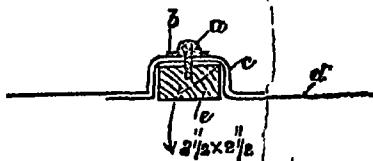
shows one method of fixing plain sheet-iron on to a roof. a is the screw by which the iron is fastened on to the batten (e); b is the leaden washer; c and d are the sheets of iron which overlap above the abattens. The battens run from the ridge to the eaves of the roof. Scale = $\frac{1}{16}$.
